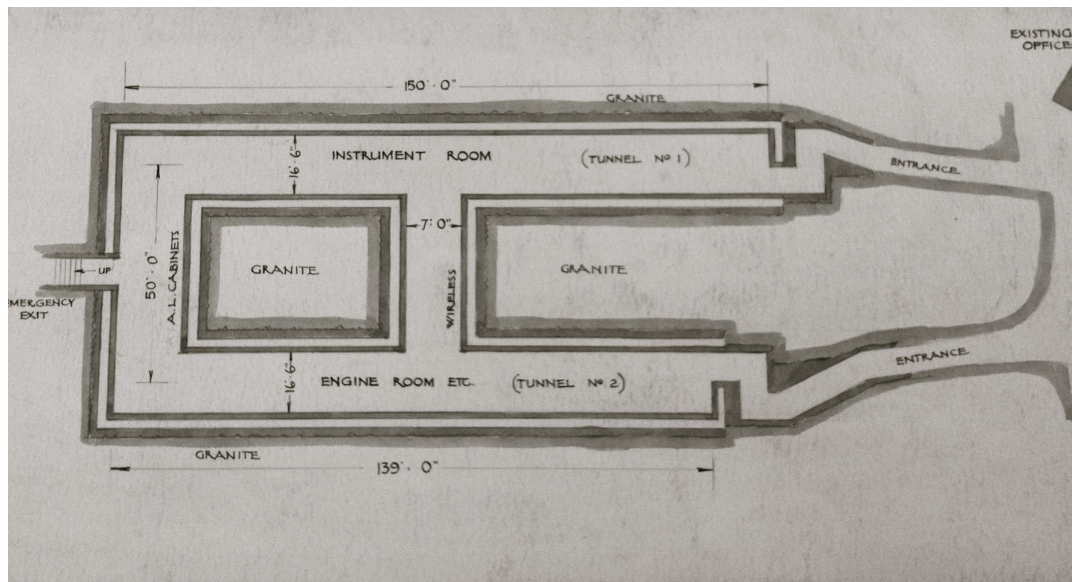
Engineer-in-Chief's drawing of the final tunnel layout.
